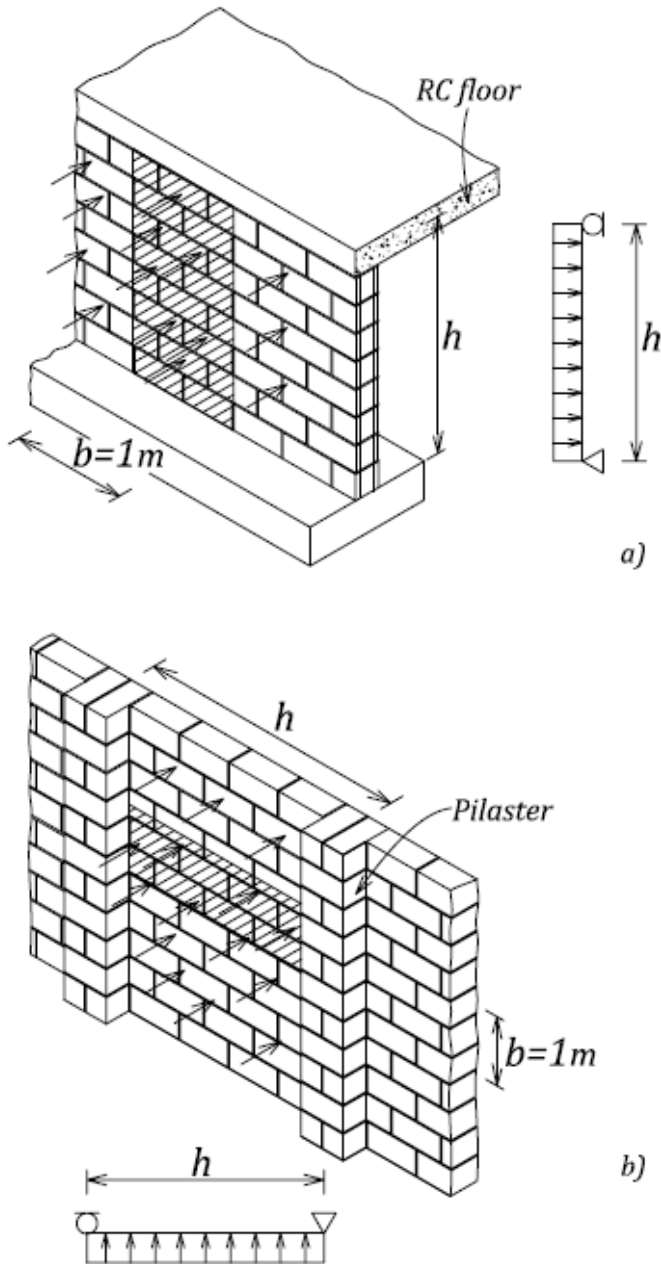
Masonry walls under out-of plane seismic loads: a) spanning vertically between floor/roof diaphragms; b) spanning horizontally between pilasters.
